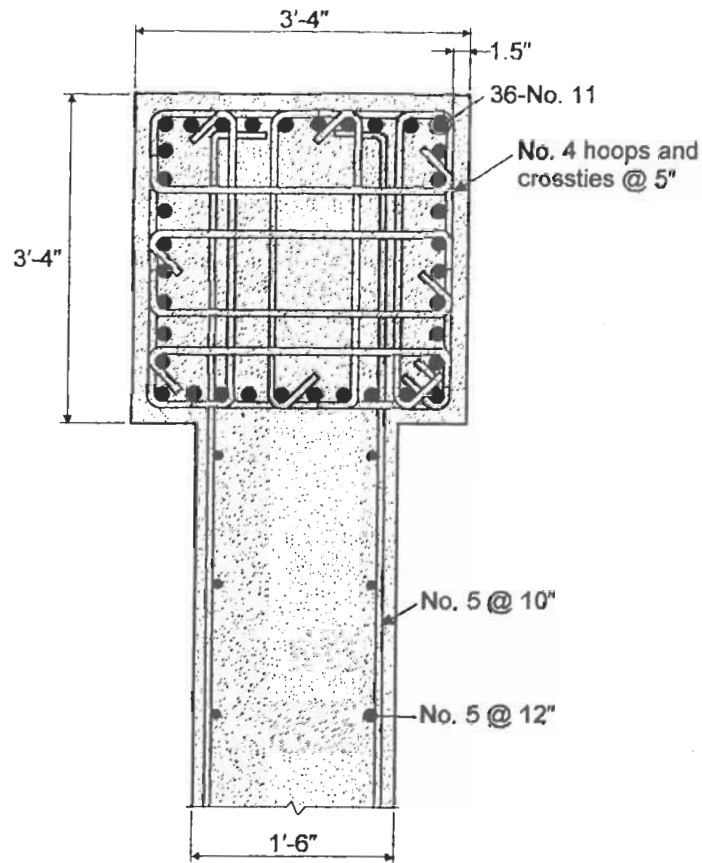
Reinforcement Details for Shear Wall Along Line 7 (SDCE)
